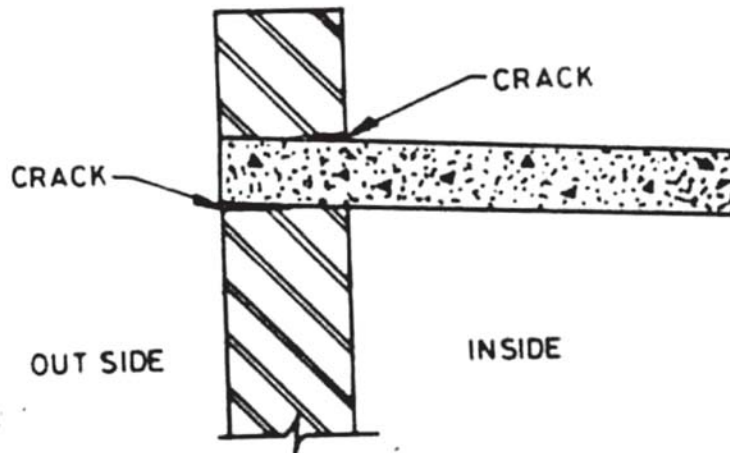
Horizontal Cracks in a Wall at Supports due to Excessive Deflection of a Slab of Large Span (Ref : SP25 (S&T) 1984)
